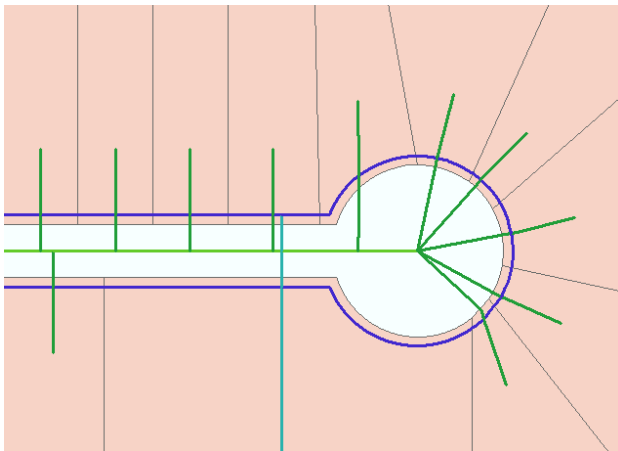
Layout of driveways in Cul-de-Sac heads
